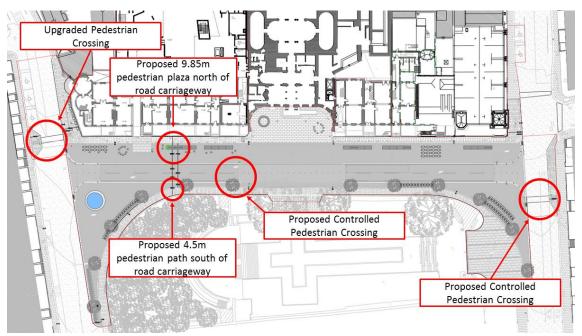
Proposed Changes to the Road Carriageway Layout
